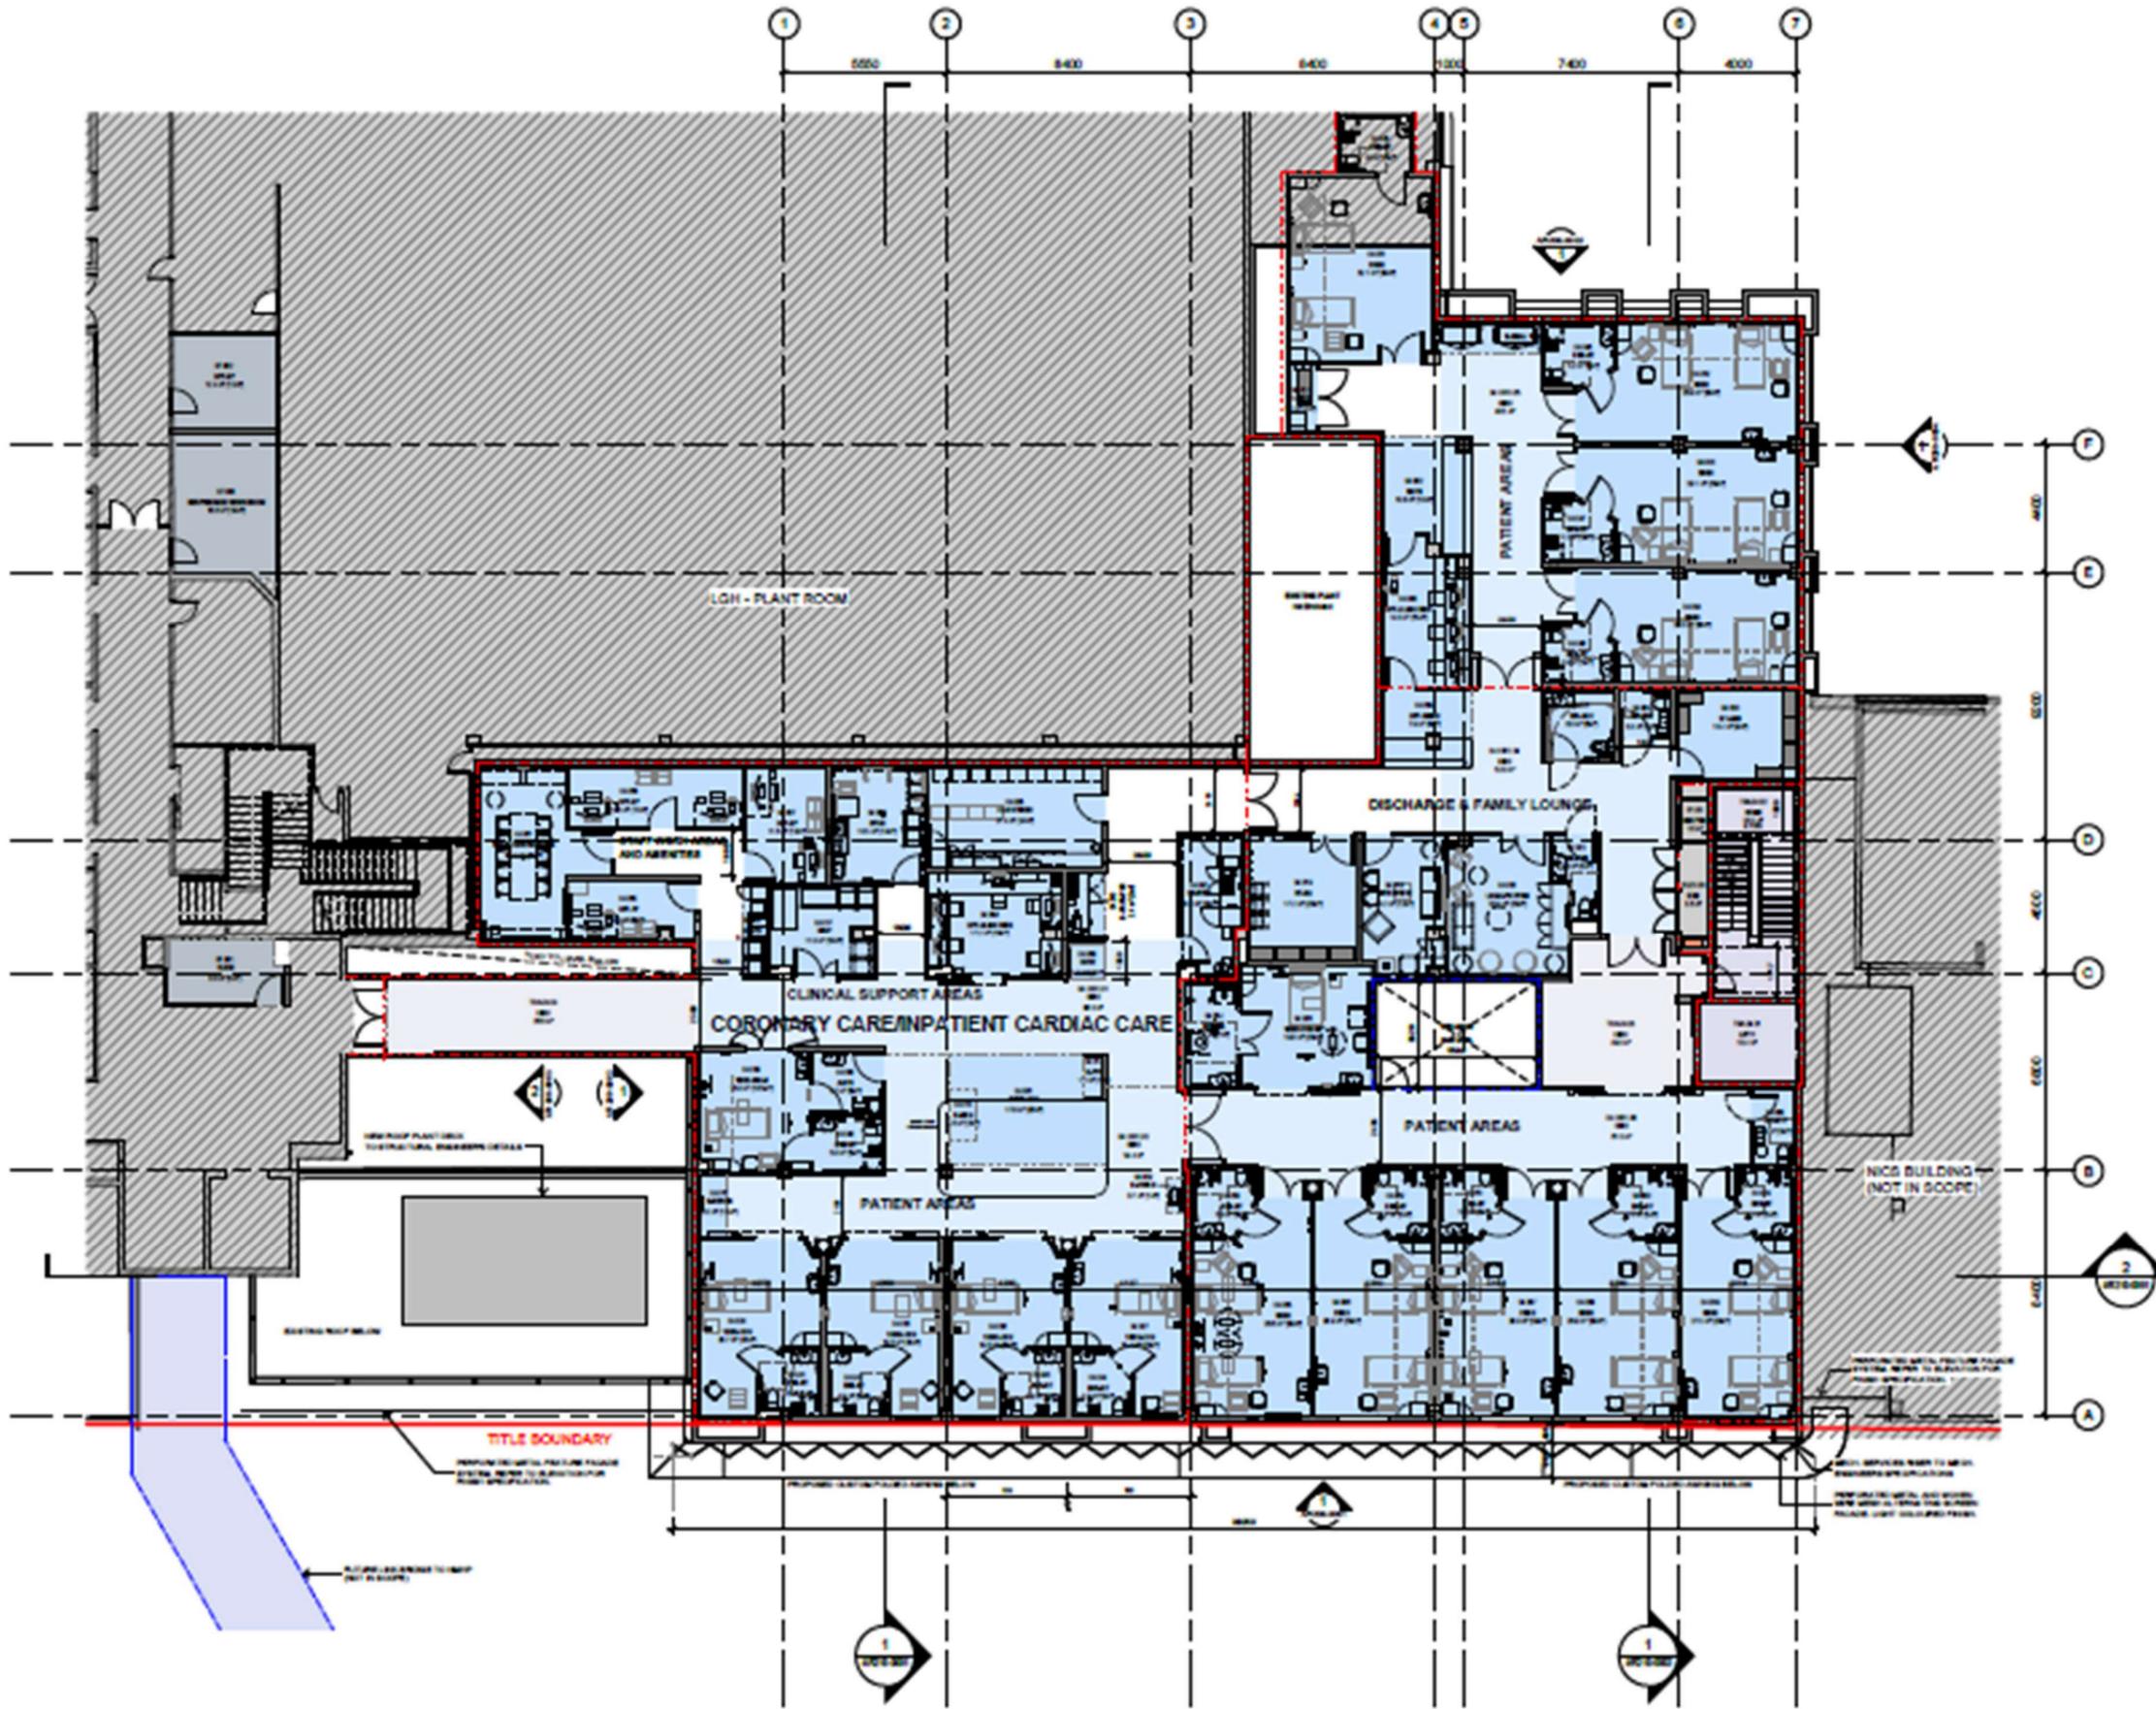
Northern Heart Centre Proposed Floor Plan – Level 4
